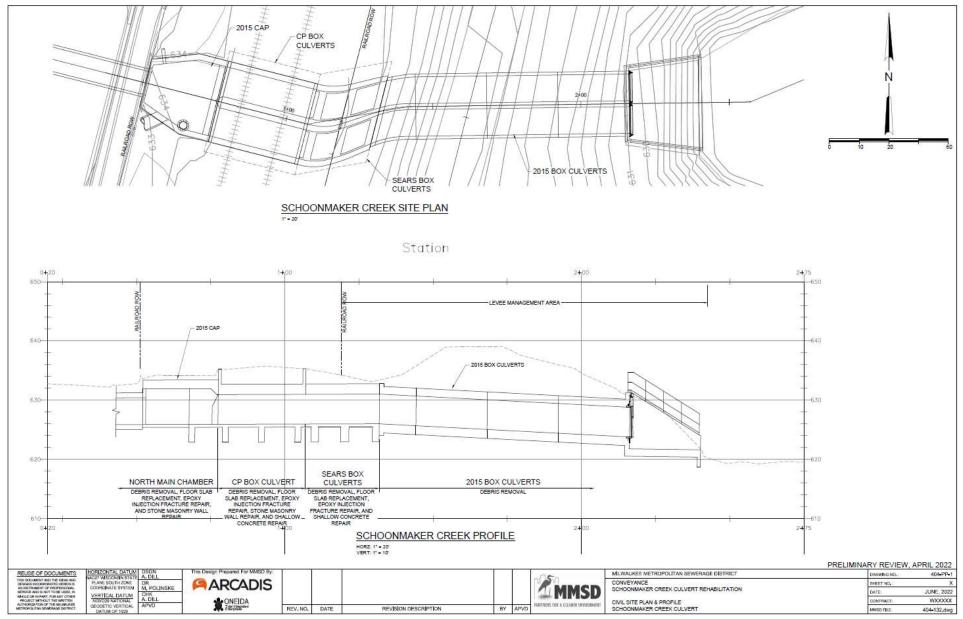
Schoonmaker Creek Culvert Plan and Profile and Recommended Repairs
